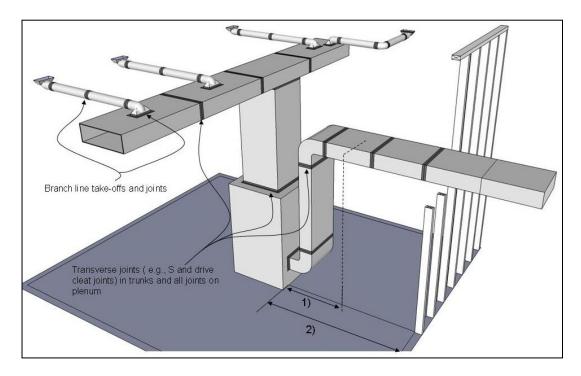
Duct sealing requirements Forming part of section 0 (a) (ii)
